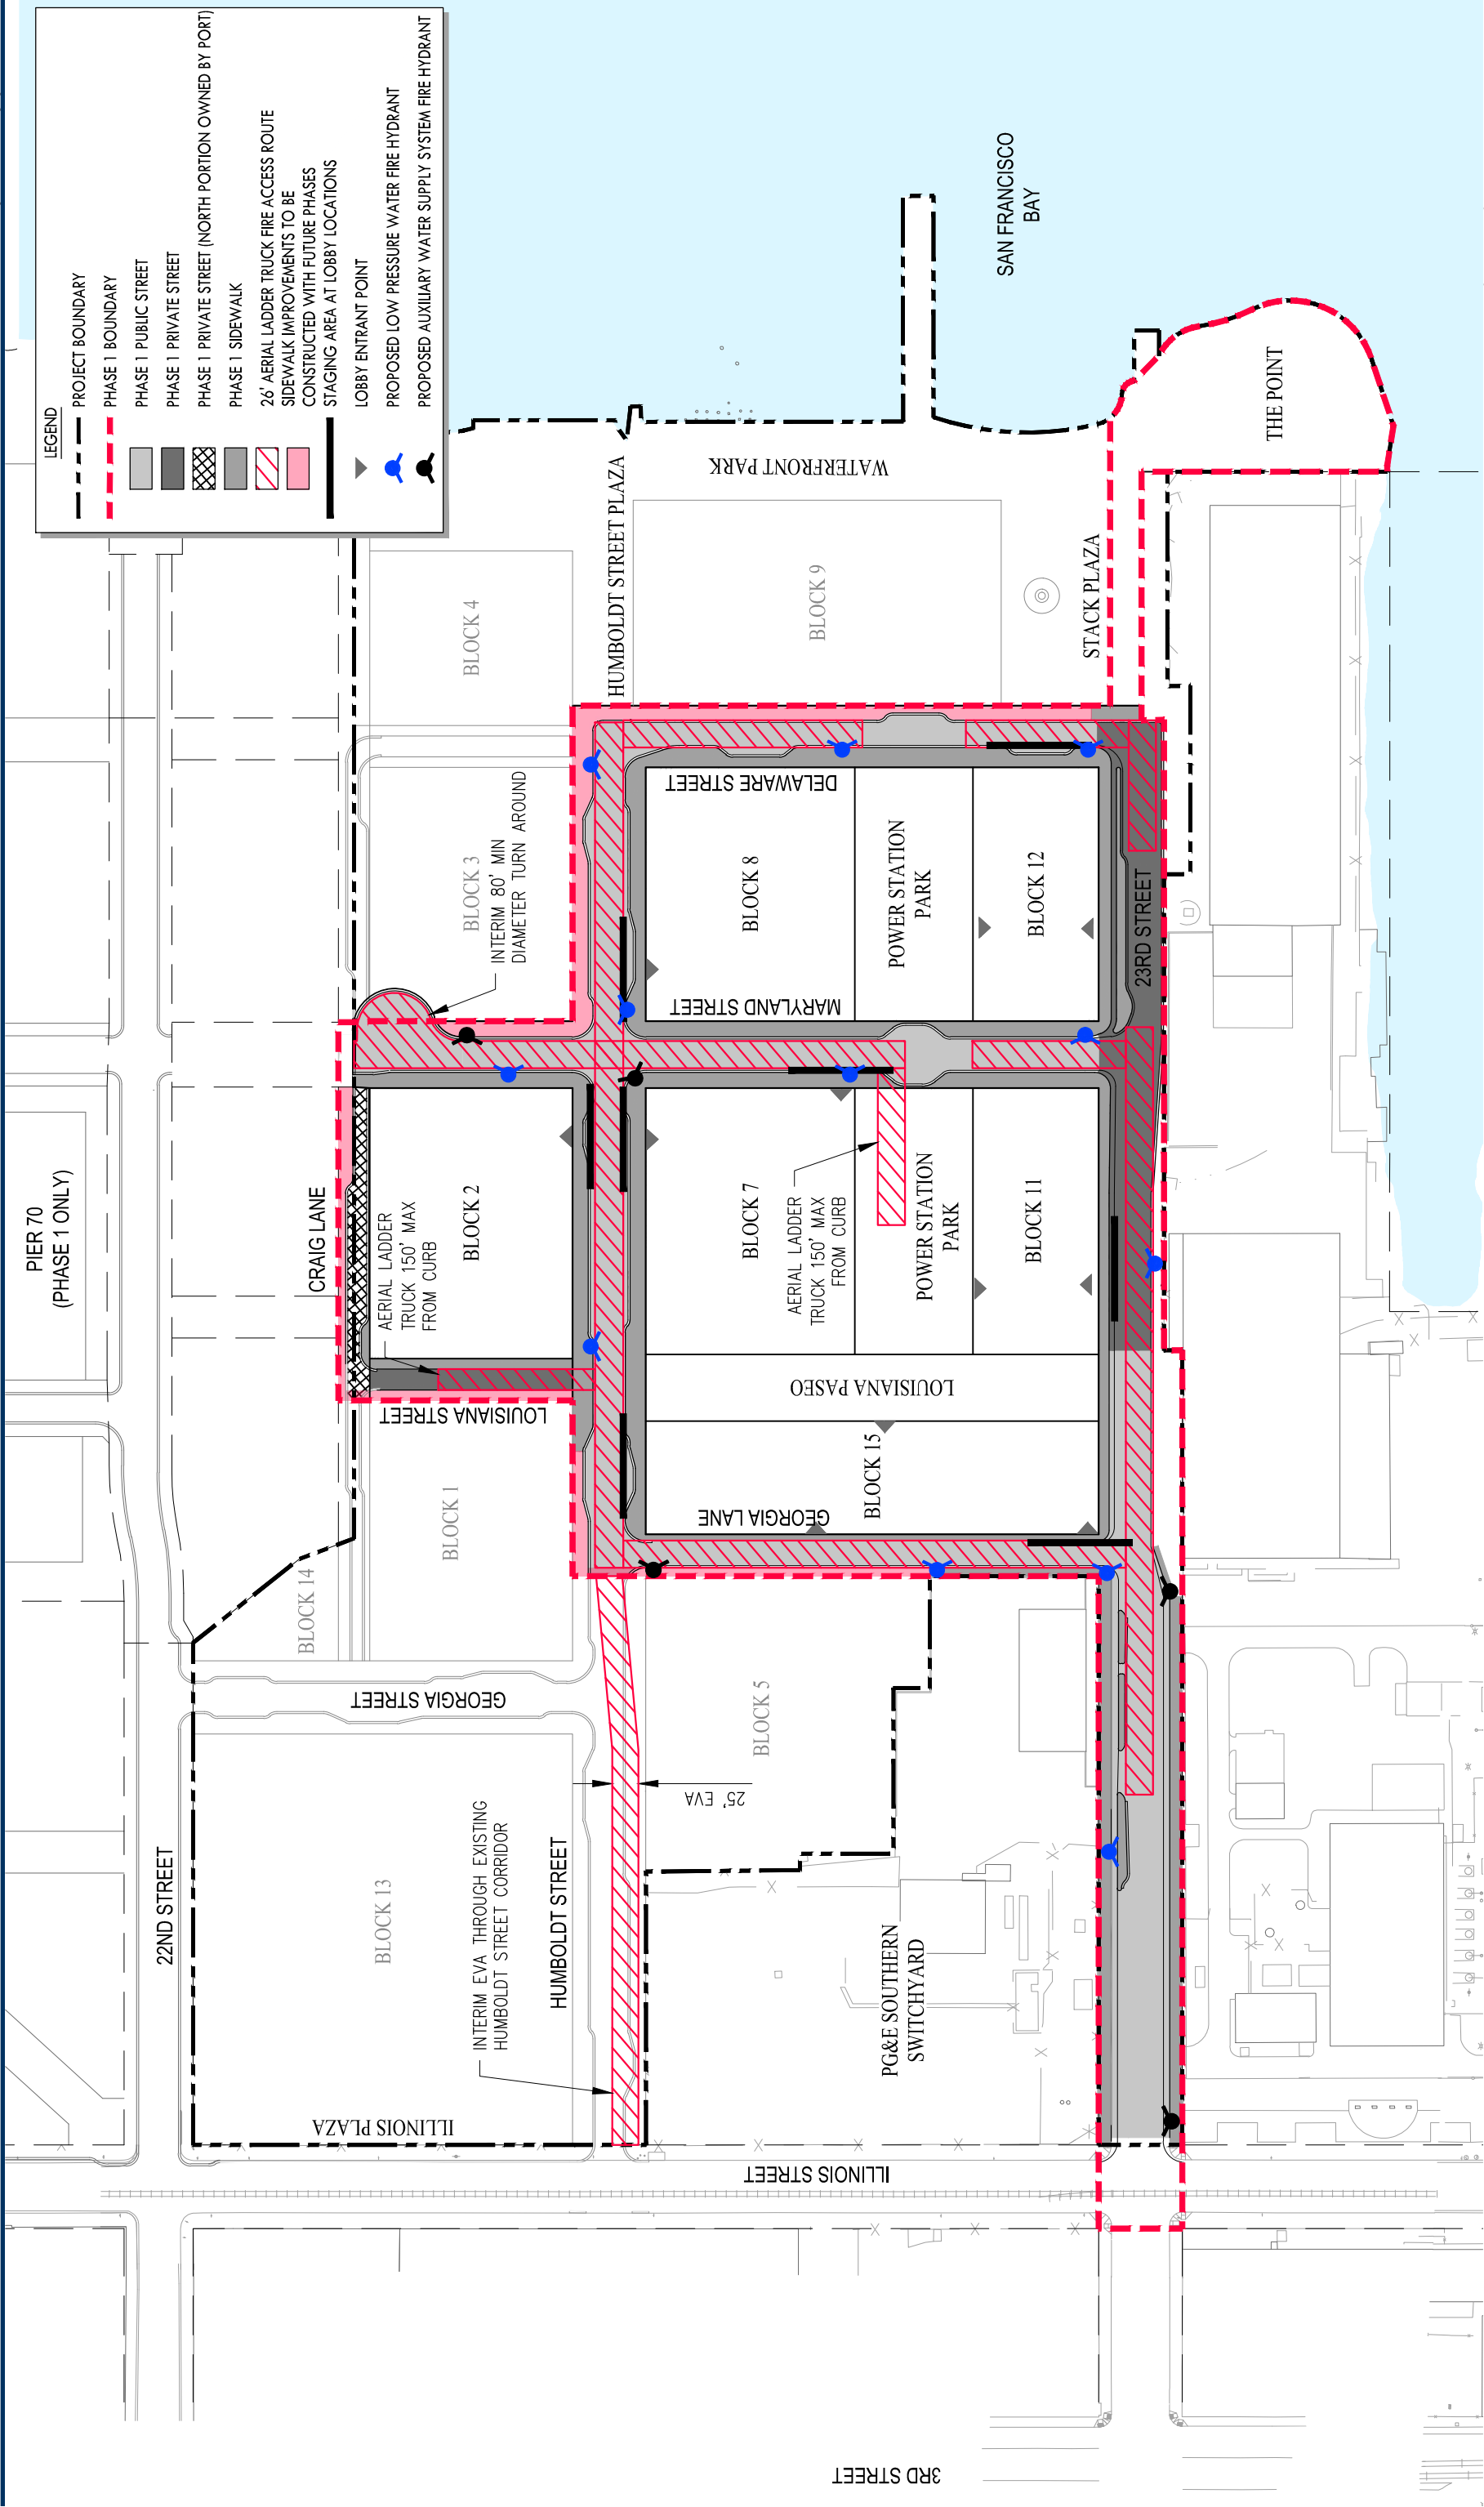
ALTERNATIVE PHASE 1 FIRE ACCESS PLAN
